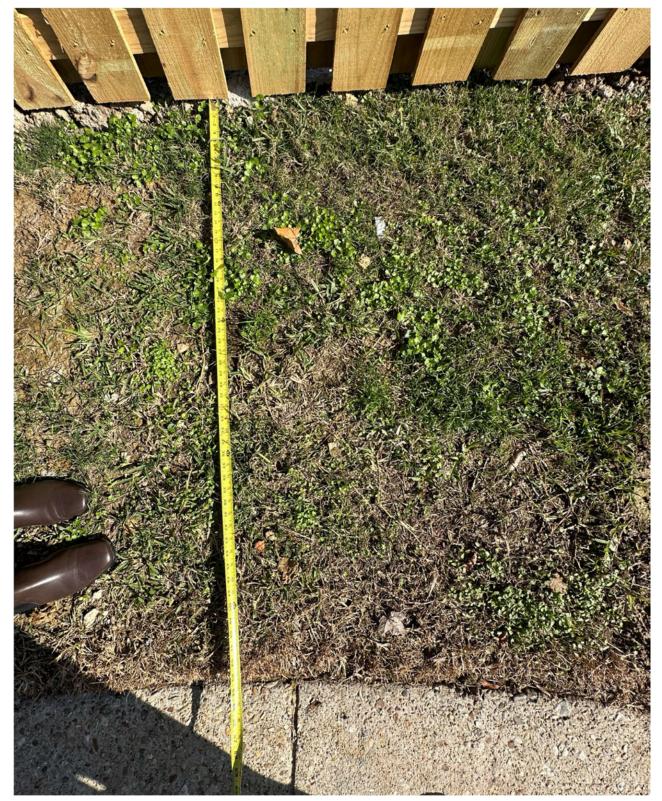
Fence measured 4 ft. 6 in. from the back of the sidewalk on 12/19/2024.
